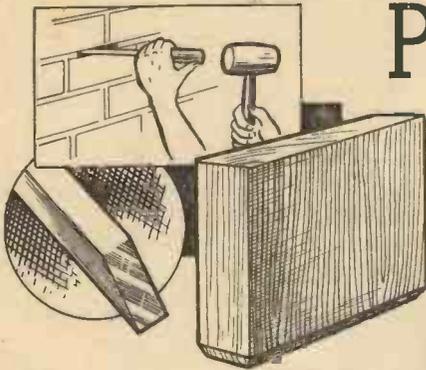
Fitting a wooden plug between the seams of two bricks.
